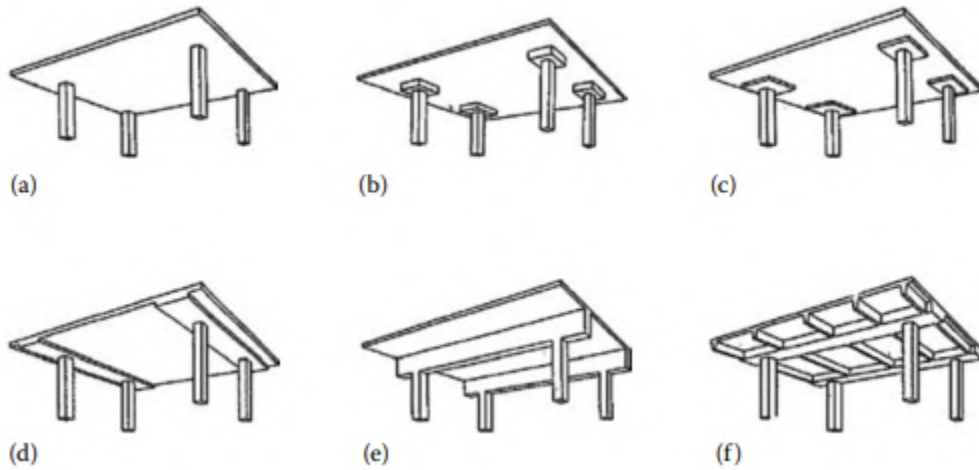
Common RC floor systems: a) Flat plate b) Flat slab with column capitals c) Flat slab with drop panels d) Flat slab with slab bands e) Flat slab with one-way beam f) Skip joist slab (Taranath, 2010)
